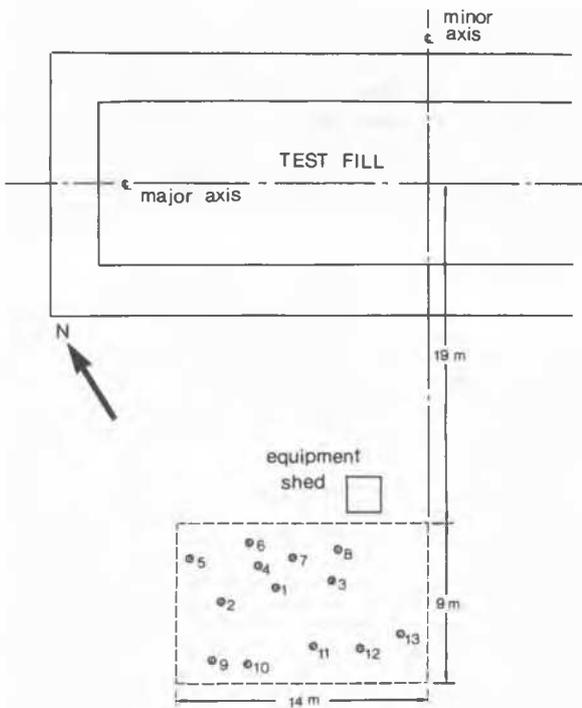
Location of the Screw Plate Tests Gloucester Test Fill
